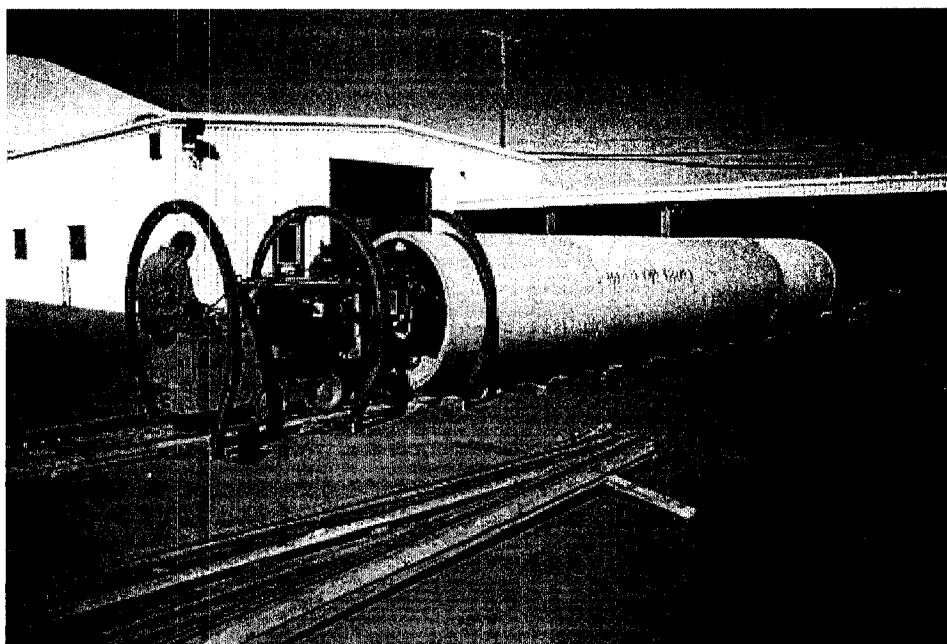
Pre-cast concrete pipe installation (City of Edmonton)
